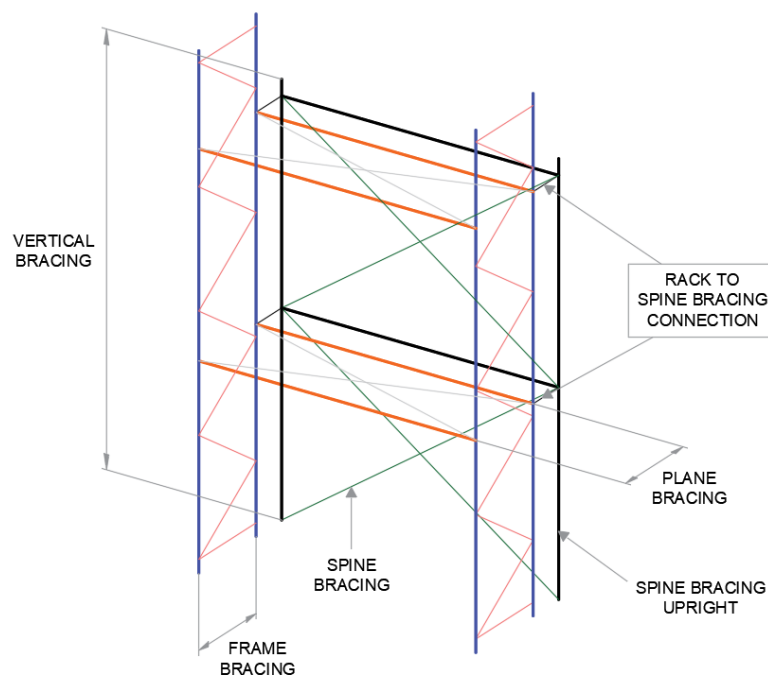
Spine bracing layout (adopted from FEM 10.2.08, 2011).
